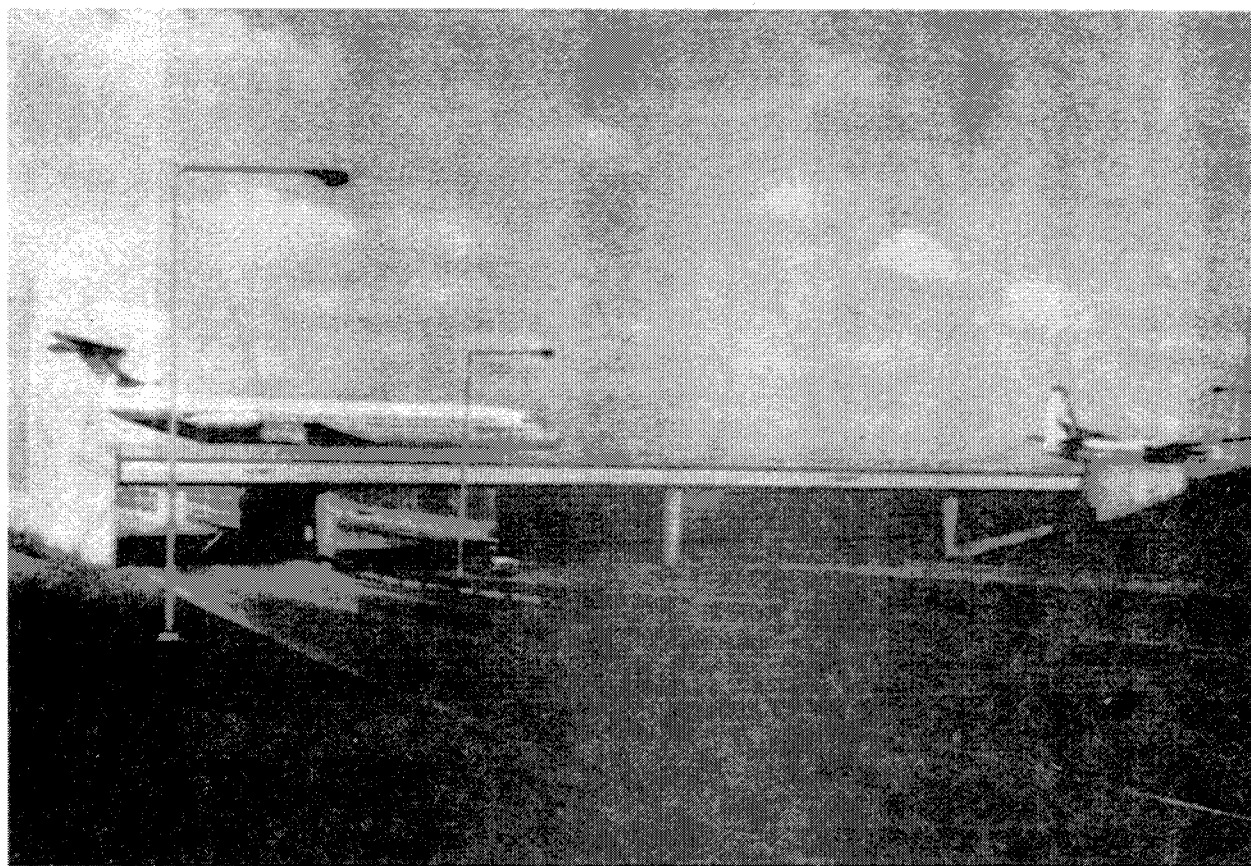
Example structural deck and depressed roadway, O'Hare Airport, Chicago, IL
